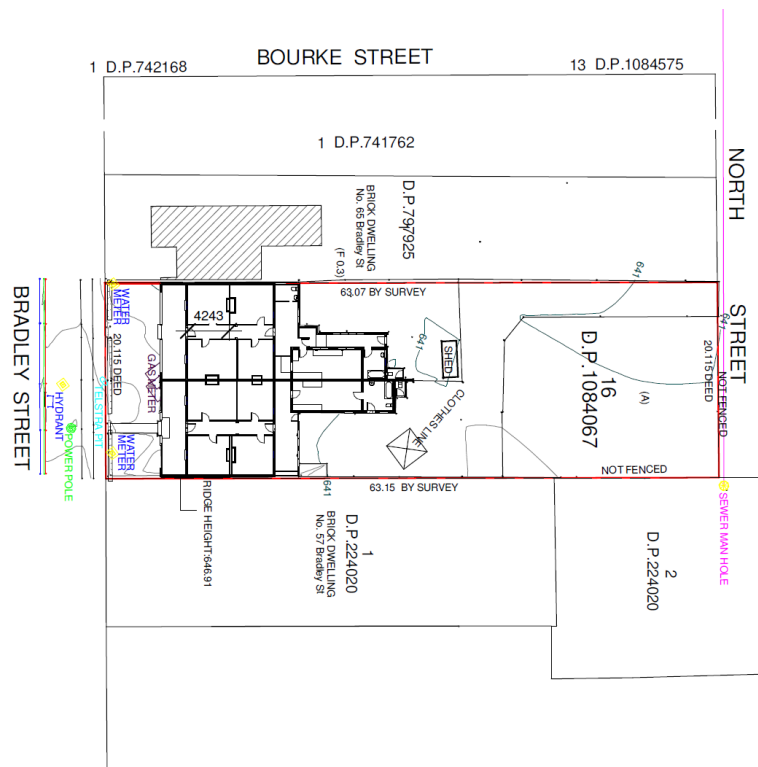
61-63 Bradley Street existing conditions plan (Source: TLA)
